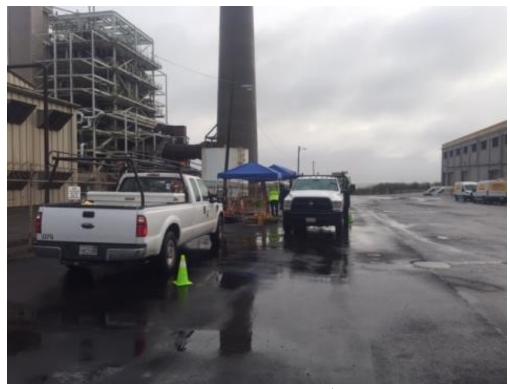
Crew working in transition vault on 23rd Street. View northeast, December 22, 2015. Photo courtesy of PG&E.
